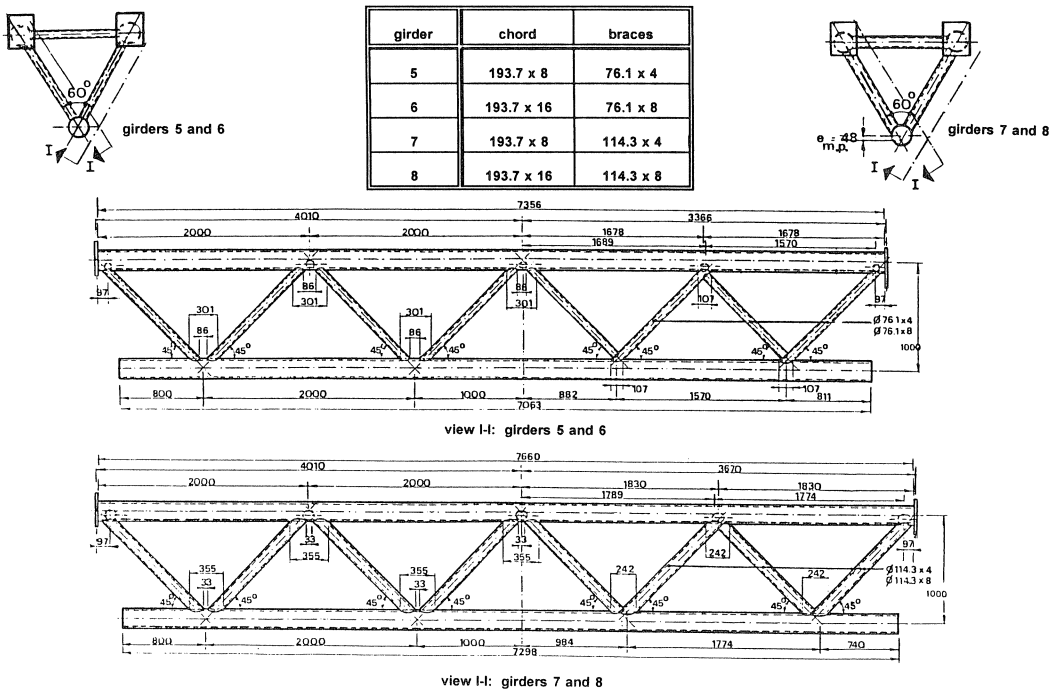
Configuration of tested girders 5, 6, 7 and 8.
